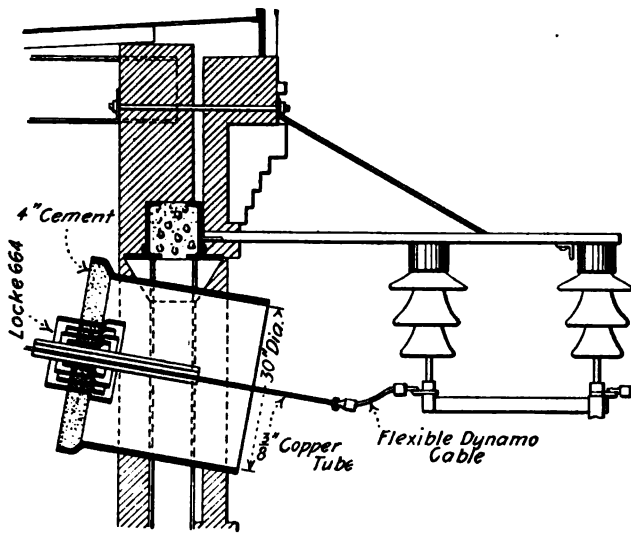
NIAGARA, LOCKPORT AND ONTARIO POWER CO. DETAIL OF HIGH-TENSION OUTLET THROUGH WALL
